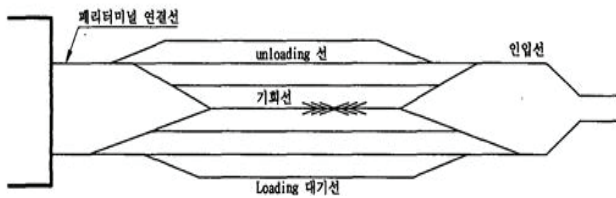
Marshalling yard and Railroad Facilities (한국철도기술연구원, 2003)
